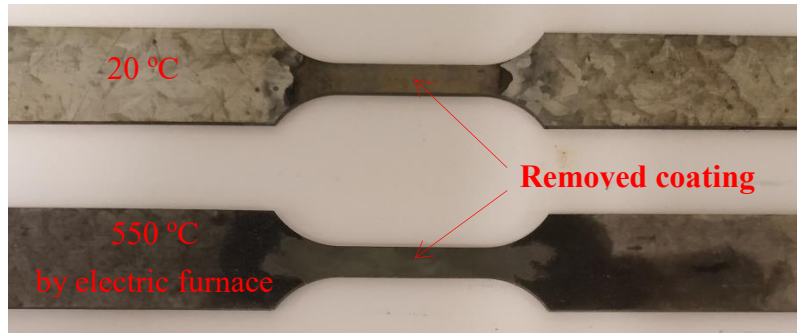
Coupon specimens of Series 120-G500 after coating removed at gauge length part
